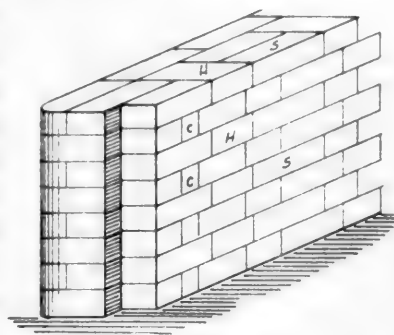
A 14 inch thick brick wall in Flemish bond showing door check and bullnose corner.
